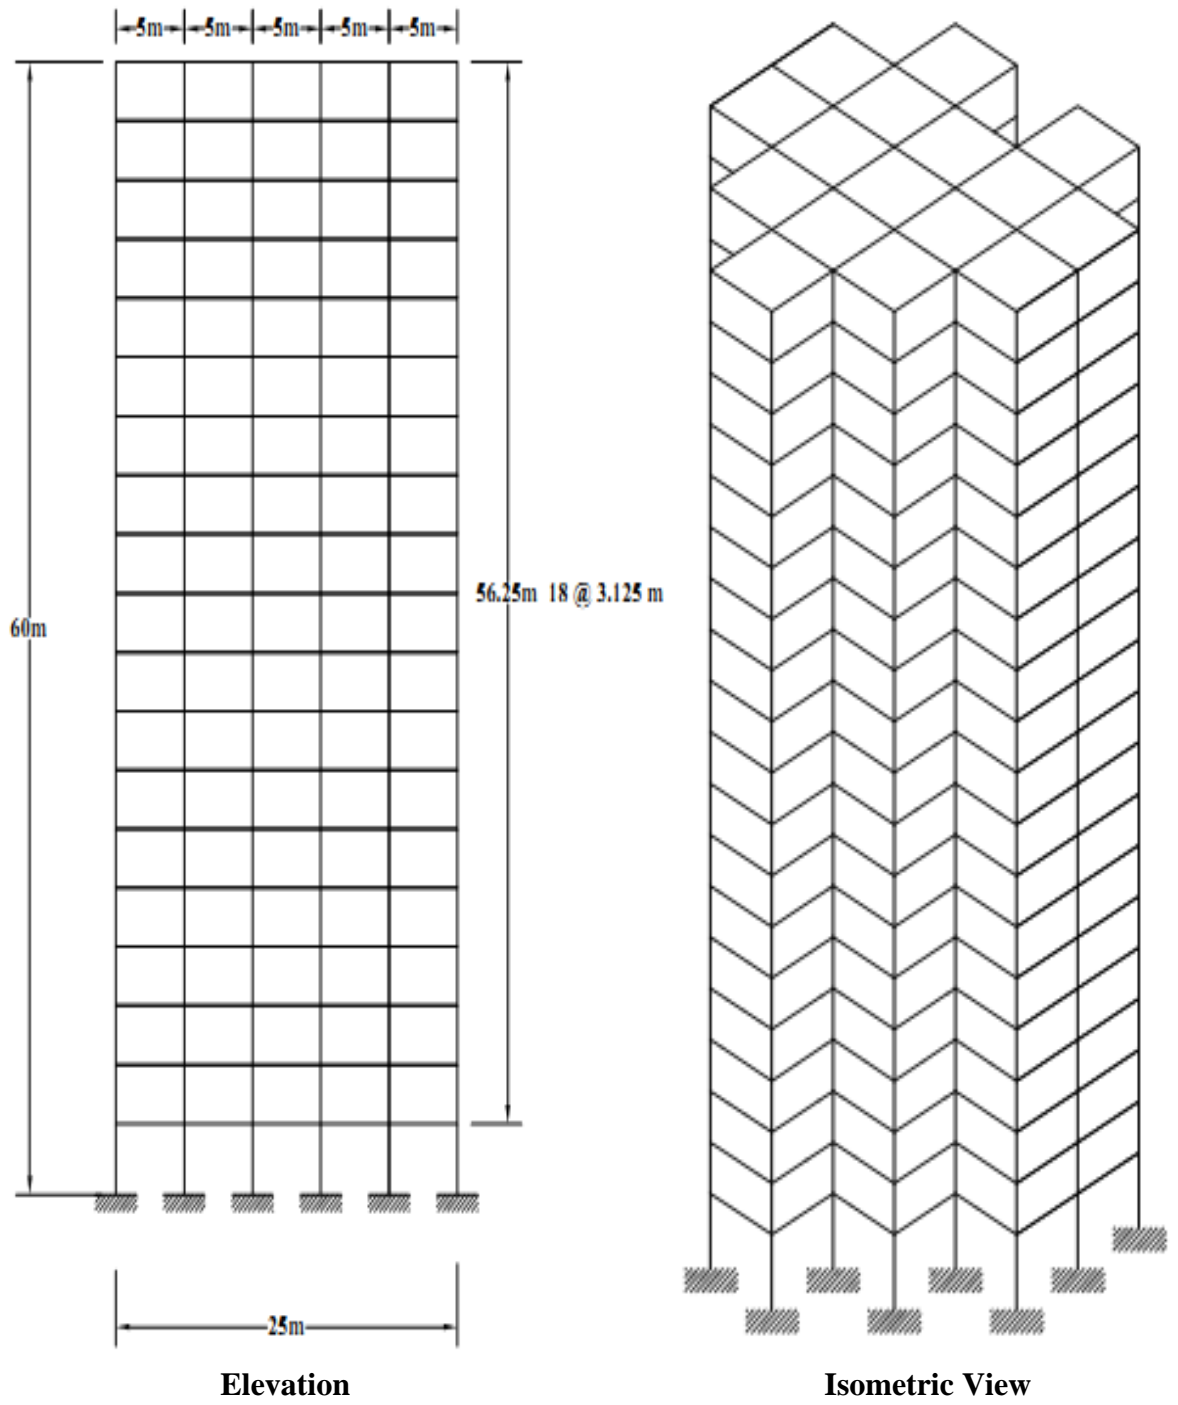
Elevation and isometric view of Fish Shape-1 building
